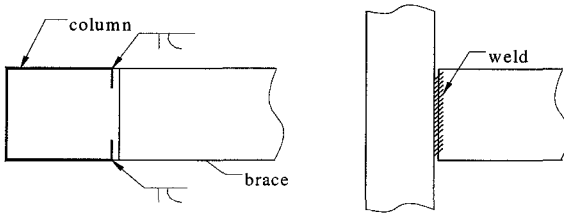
Joint Detail Resisting Post Twisting (Brace Matches Post Width)
